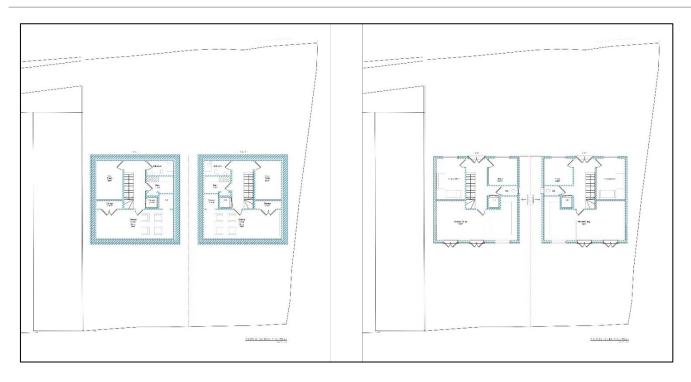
Proposed Basement & Ground floor layout plans (DontMoveExtend.com, Dwg. No. GR26-05-1004, Rev 1, Sept 2018)
